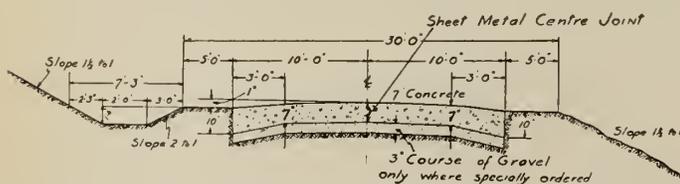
Cross Section, Concrete Pavement, Ontario Provincial Highway Construction.
